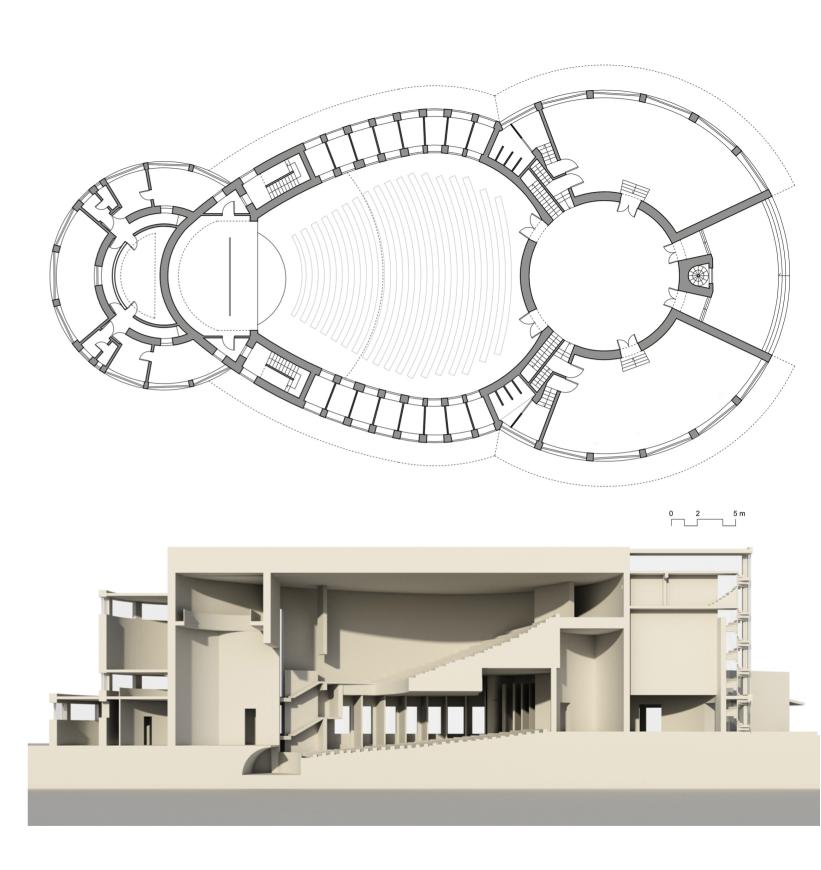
Plan of the ground floor and perspective section of the Kina Project (by S. Vattano).
